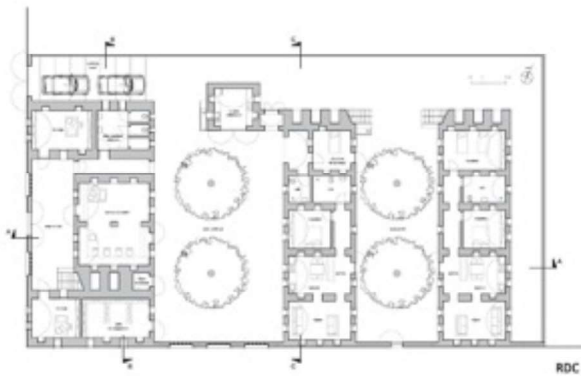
Floor plan of the first floor (©AI-Mizan Architecture)
